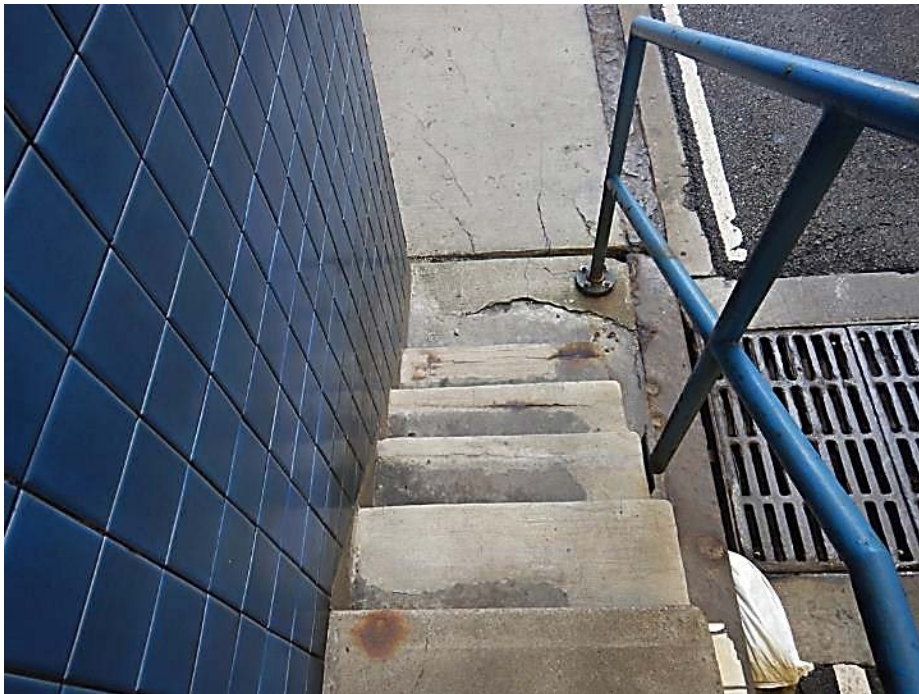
Sidewalk at STA 523+36 - Cracking with Rust Staining
